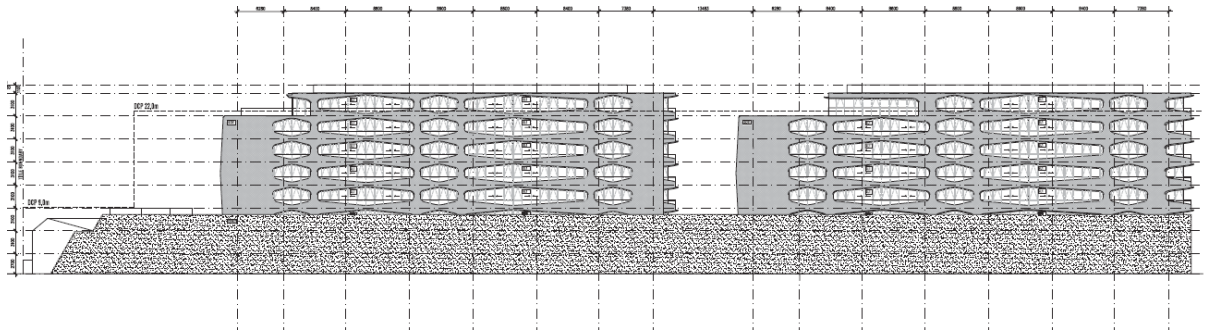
Approved Southern Elevation (top level deleted in Condition 2)
